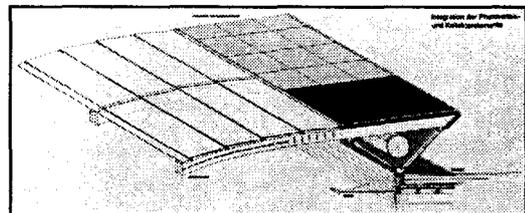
Detail of roof integration ("Haus des Waldes").
